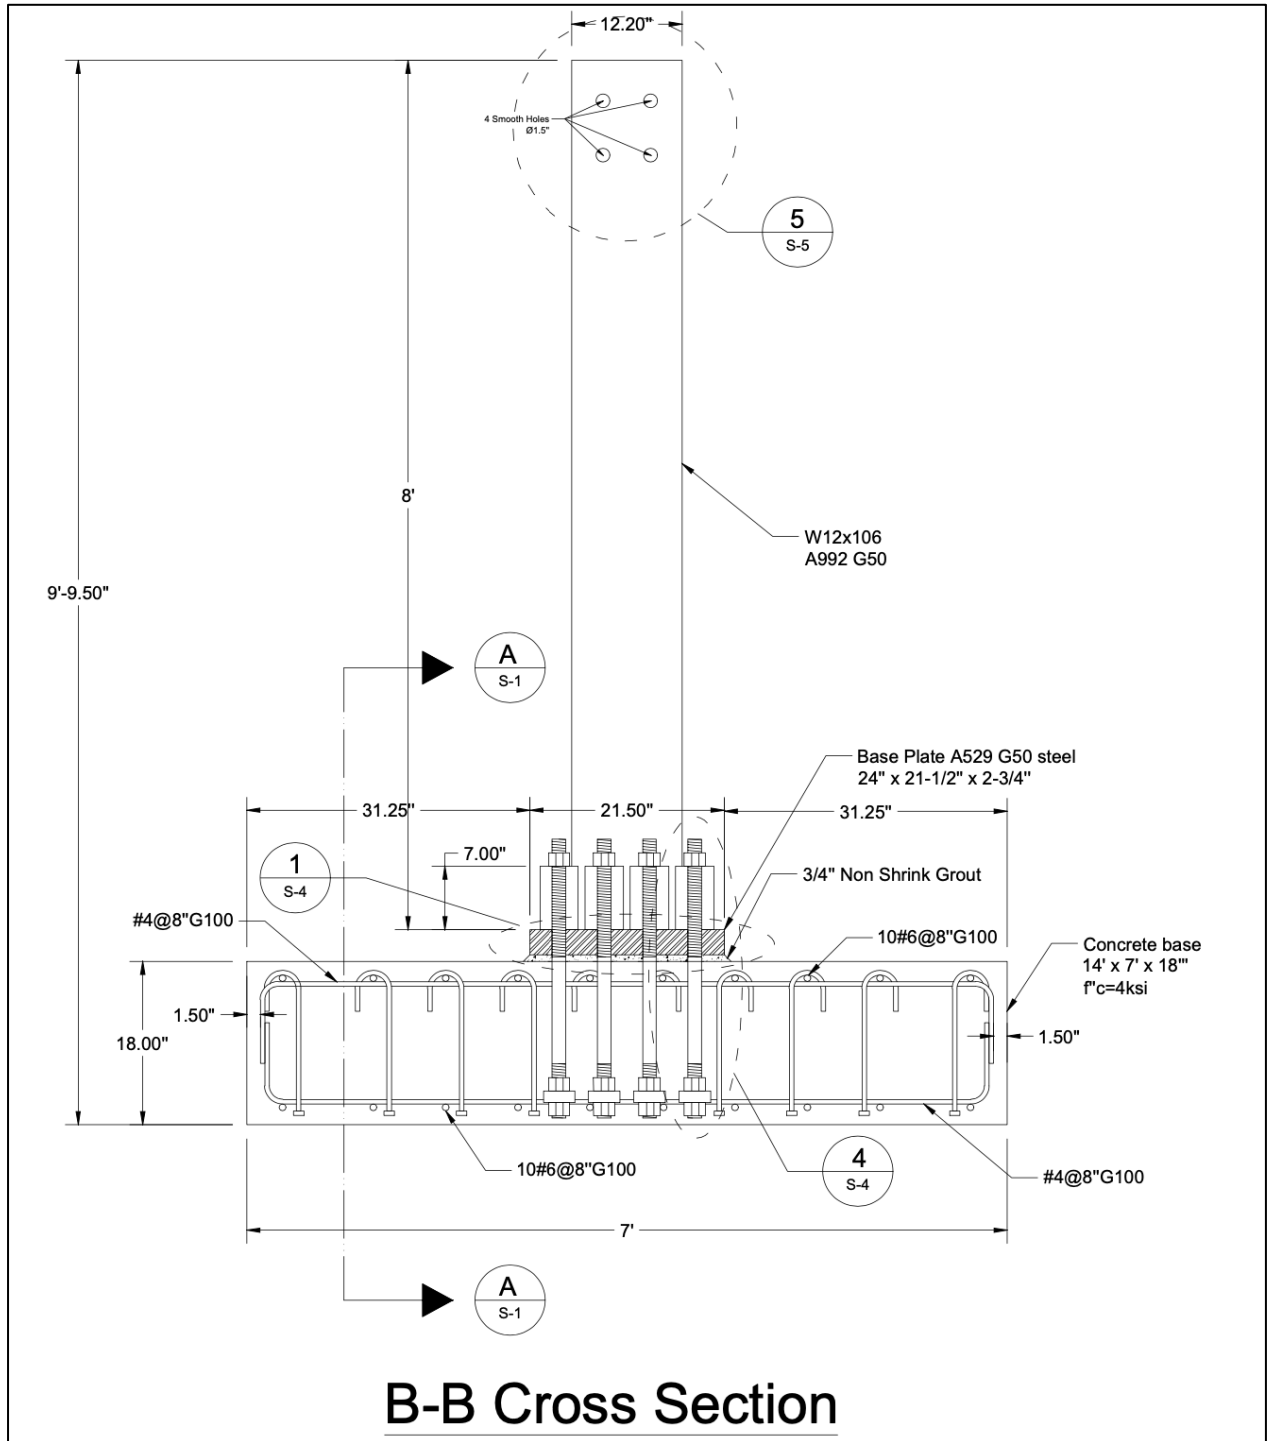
Elevation view of transverse B-B cross section of specimen
